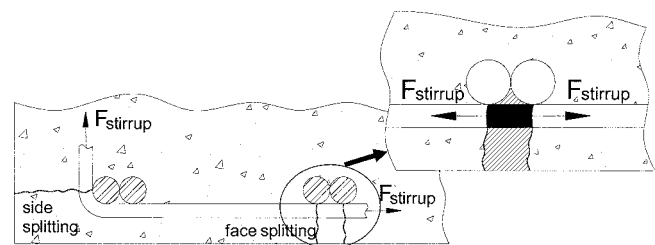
Assumed crack planes for calculation of stirrup forces.
